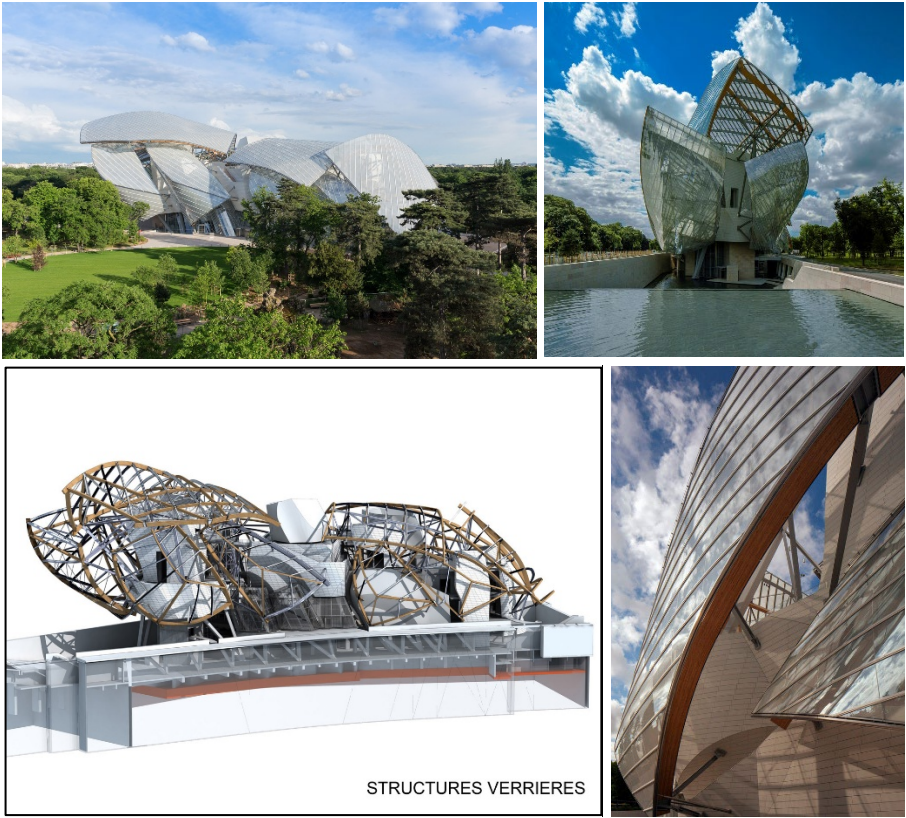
Fondation Louis Vuitton (ArchDaily, n.d.)
